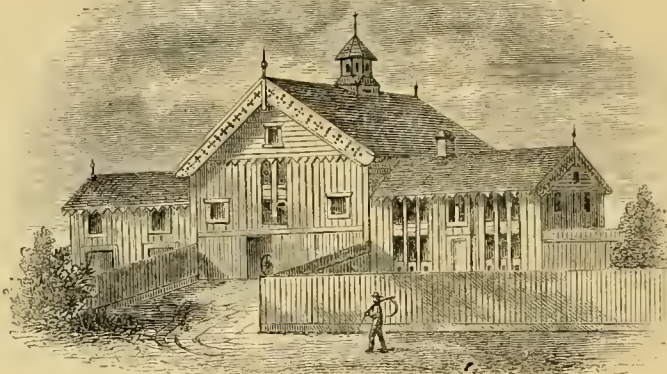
PERSPECTIVE ELEVATION OF BARN.
